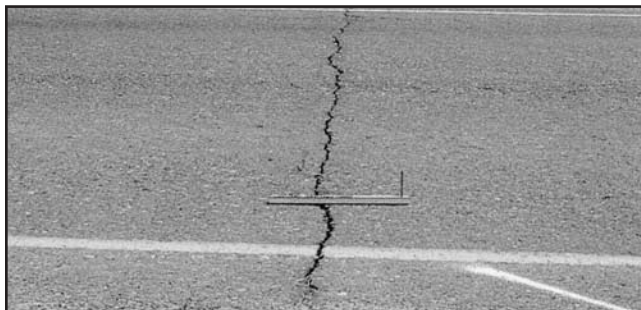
Typical low-temperature cracking in an asphalt concrete pavement.
